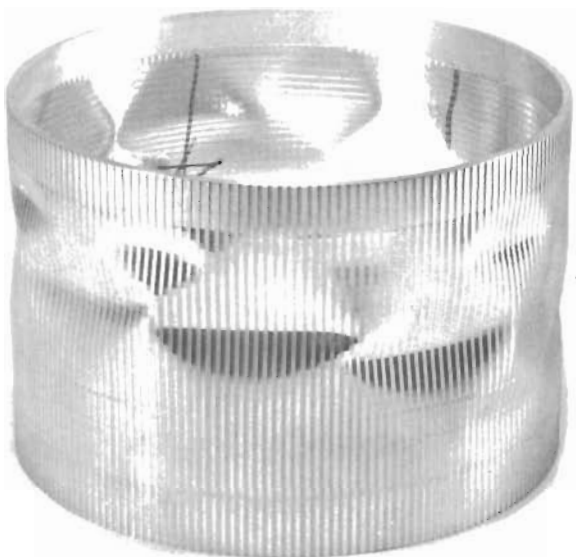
Post Failure Axial Compression Test Specimen.
